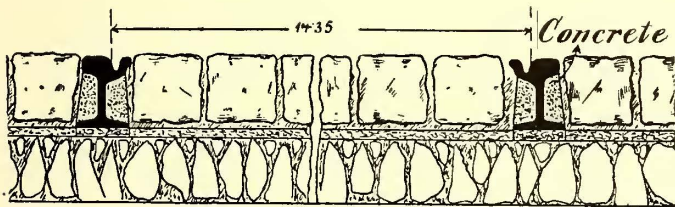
TRACK CONSTRUCTION IN BLOCK PAVING
